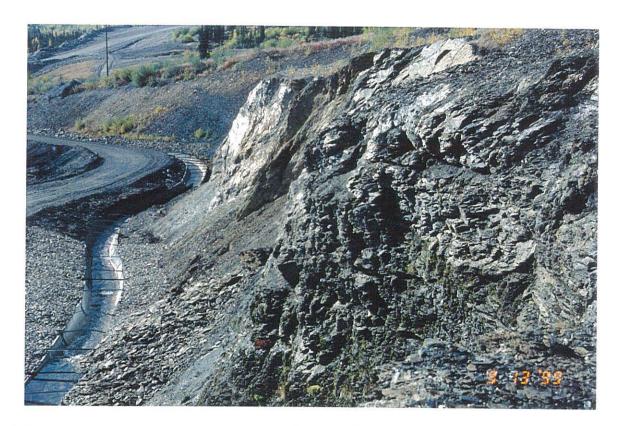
Looking downstream over the June-September 1999 rock fall area. Note step escarpment resting on adversely dipping joint.
